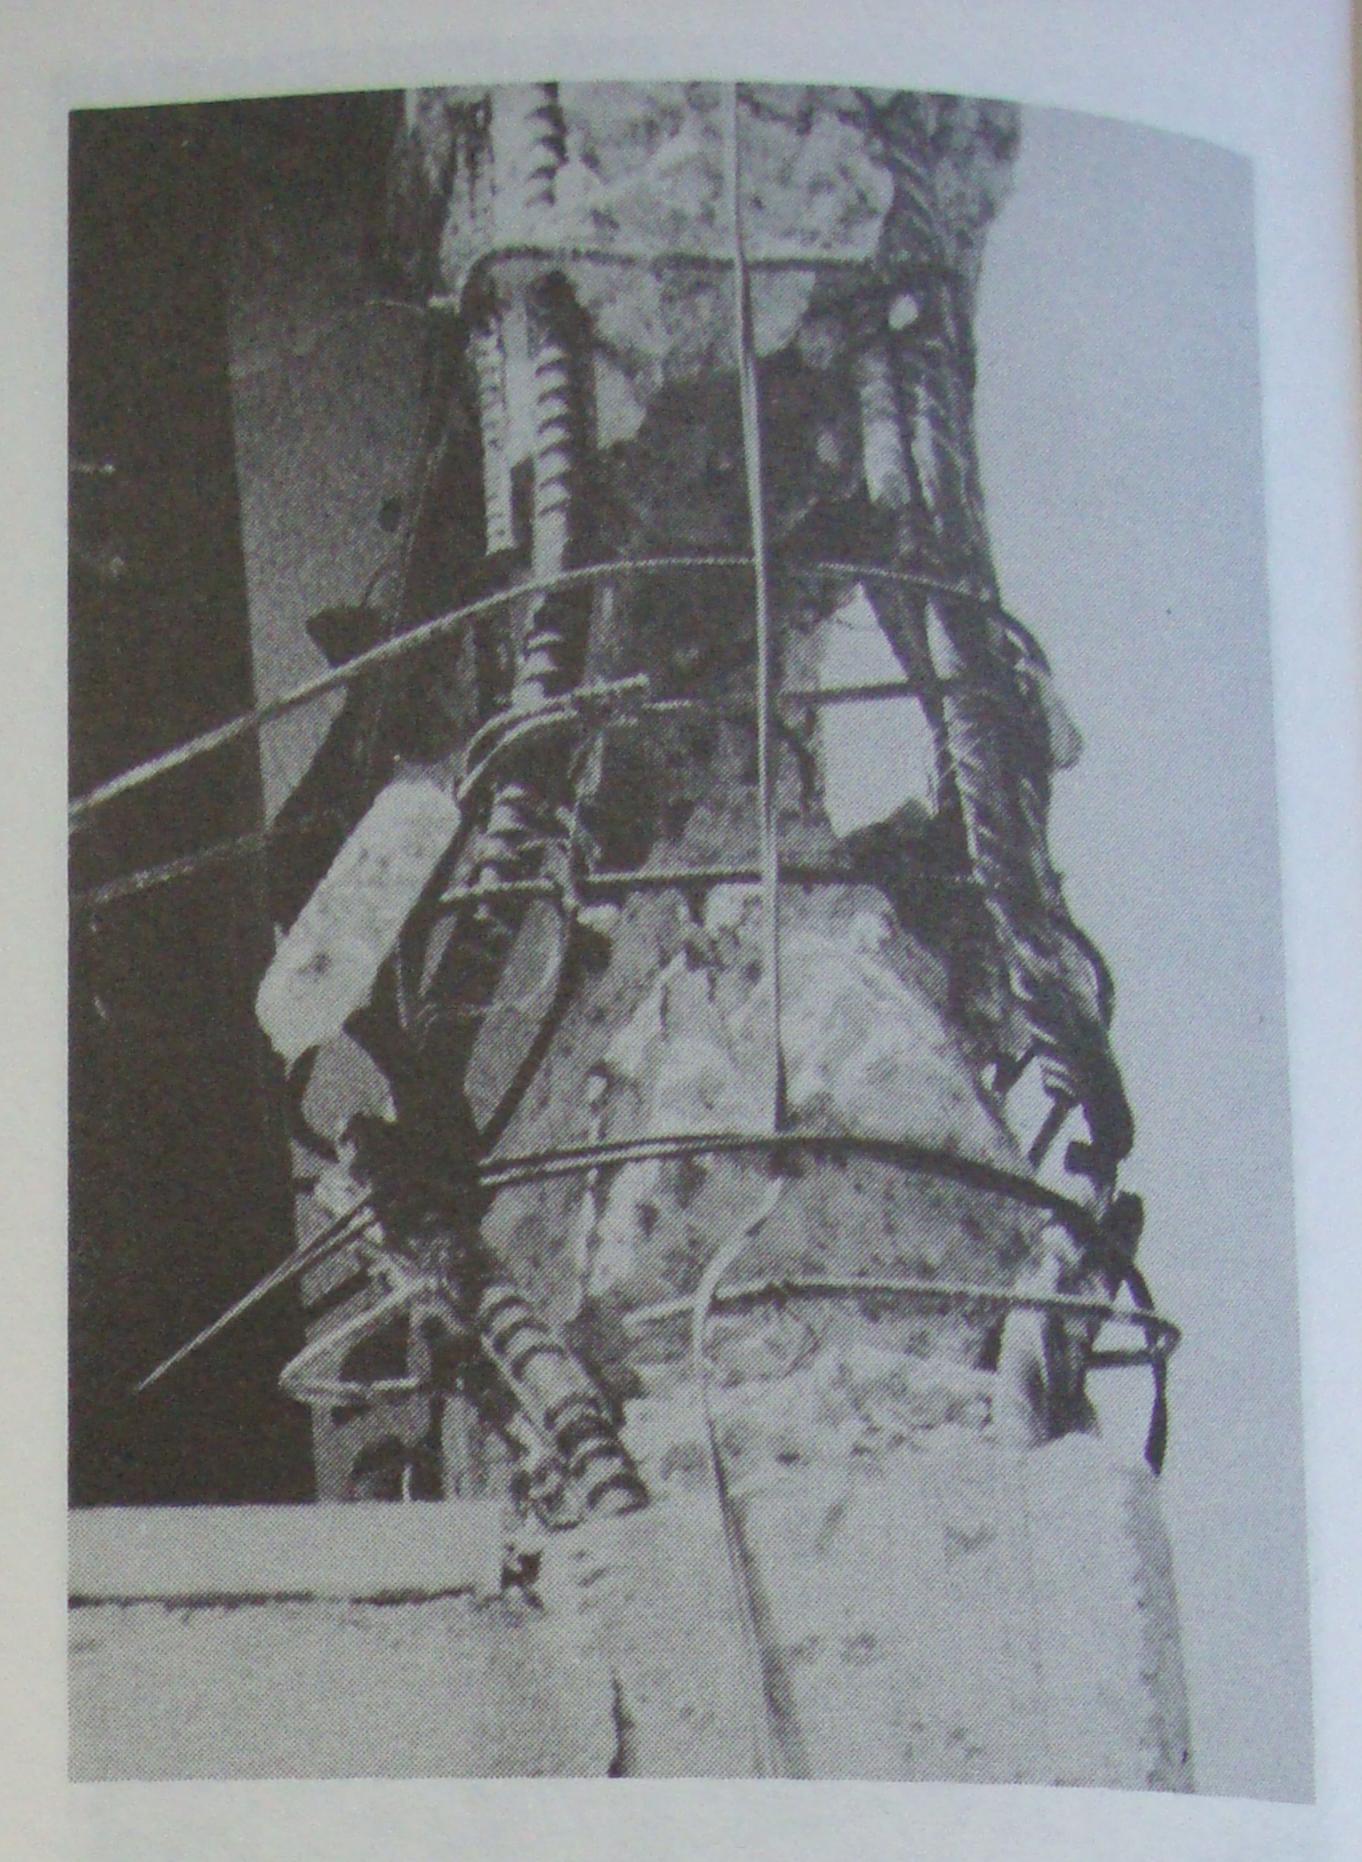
Failure of column in second storey of 14 storey Nuevo León apartment building (Mitchell et al. 1986a&b).
